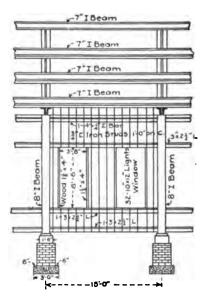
Side Elevation of Steel Building Covered with Expanded Metal and Plaster.
